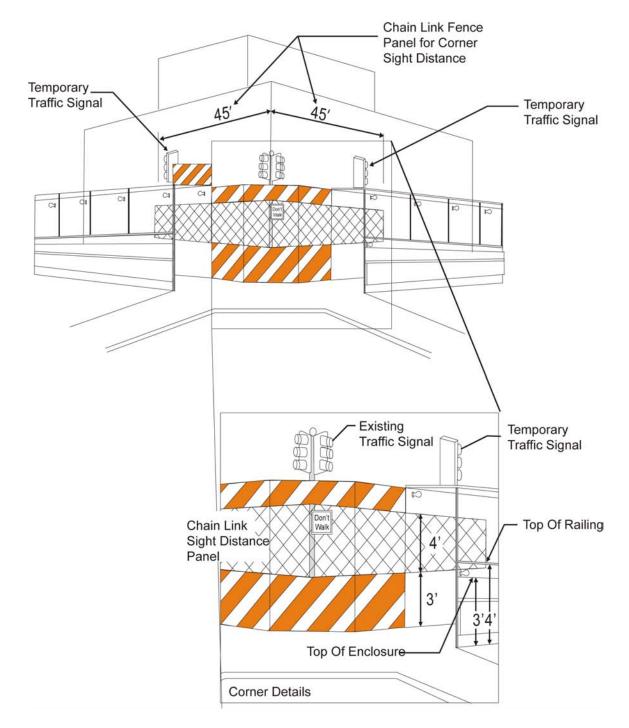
Typical Application: Covered Pedestrian Walkways – Corner Locations at Four-Way Intersections
